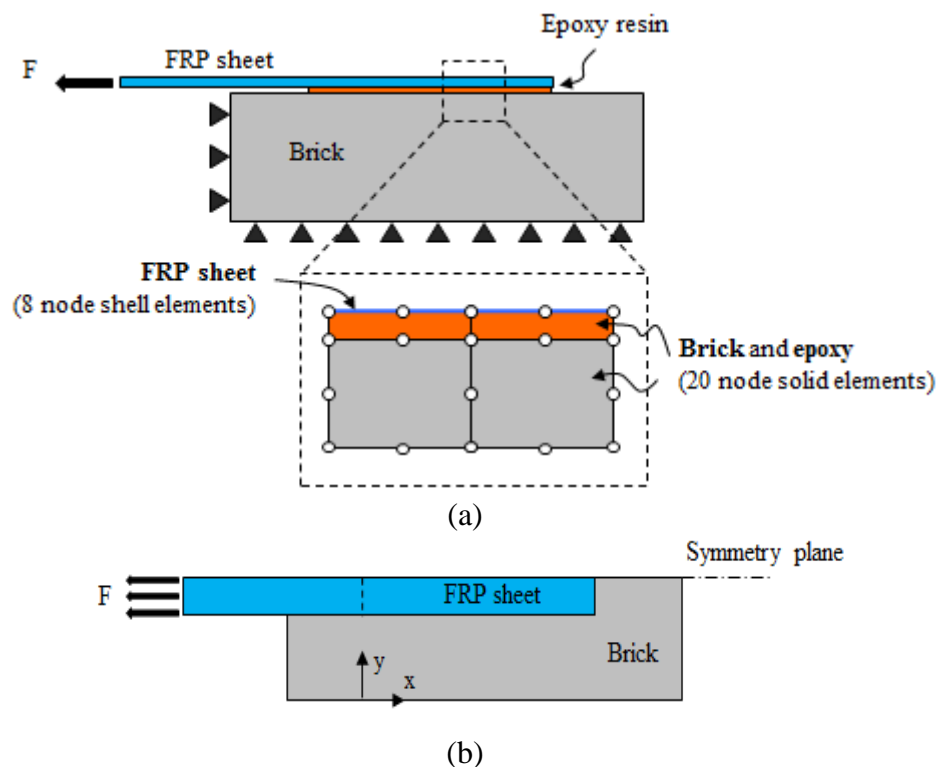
Adopted finite element model: (a) elevation; (b) top view (x-y plane).
